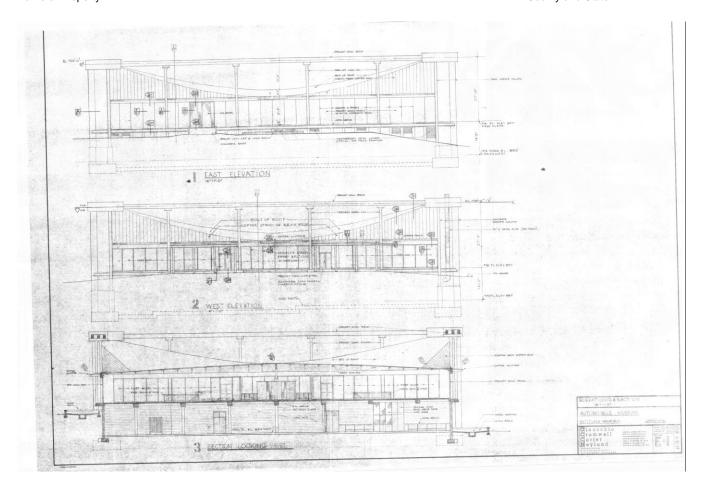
East and West elevation and Section plan for the Museum of Automobiles. From the files of the Arkansas Department of Parks and Tourism.
